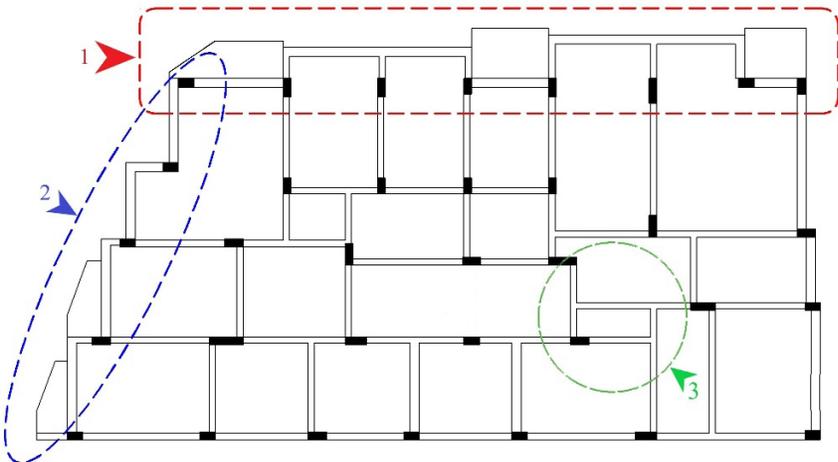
A Structure Plan with an Irregular Facade (Şahin et al., 2020)
